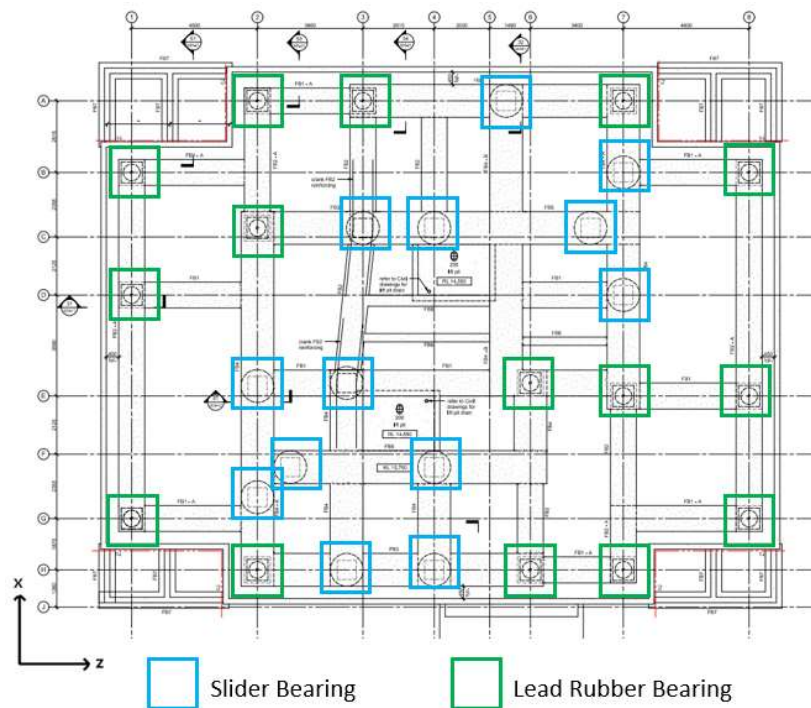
Floor plan at the ground floor showing the grillage beams and base isolators
